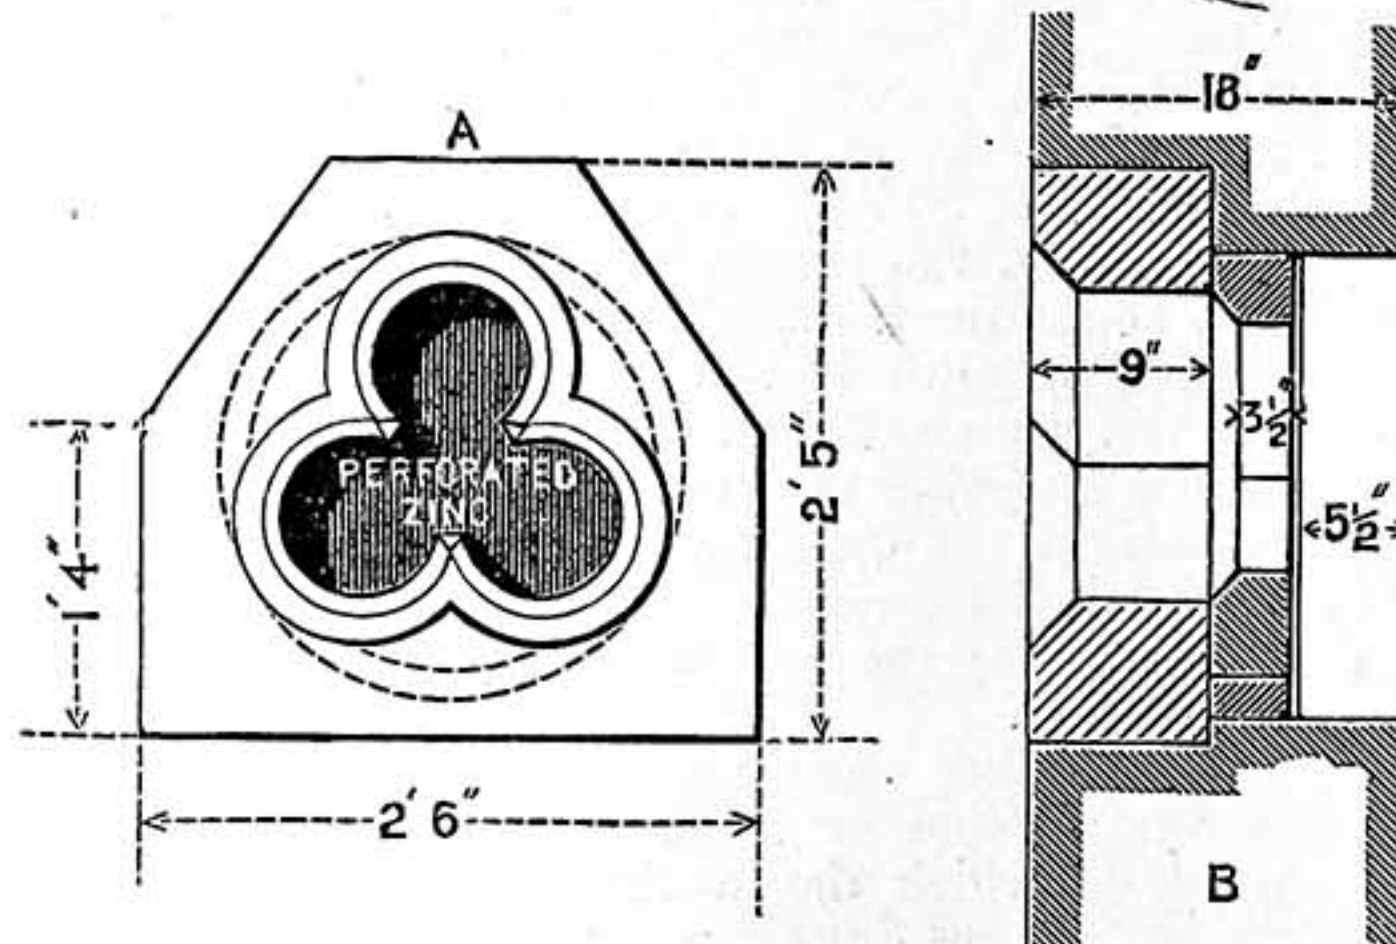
Ventilator in Elevation (A) and Section (B).
